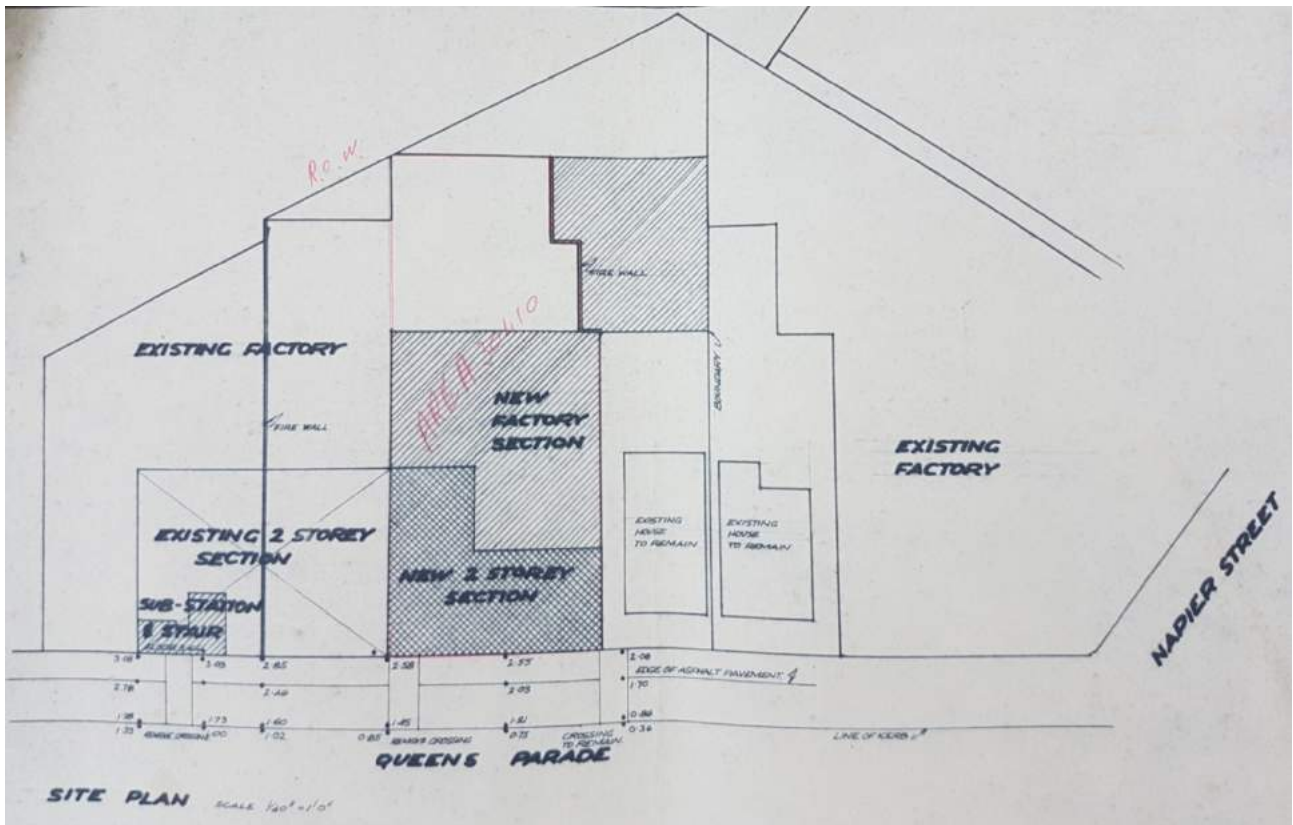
1965 drawings – site plan of the 1965 extensions to the complex (PROV, 12 March 1965).
